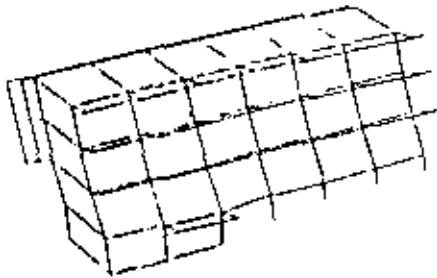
COLUMN UNDER LOAD : TRANSVERSE FRAME
